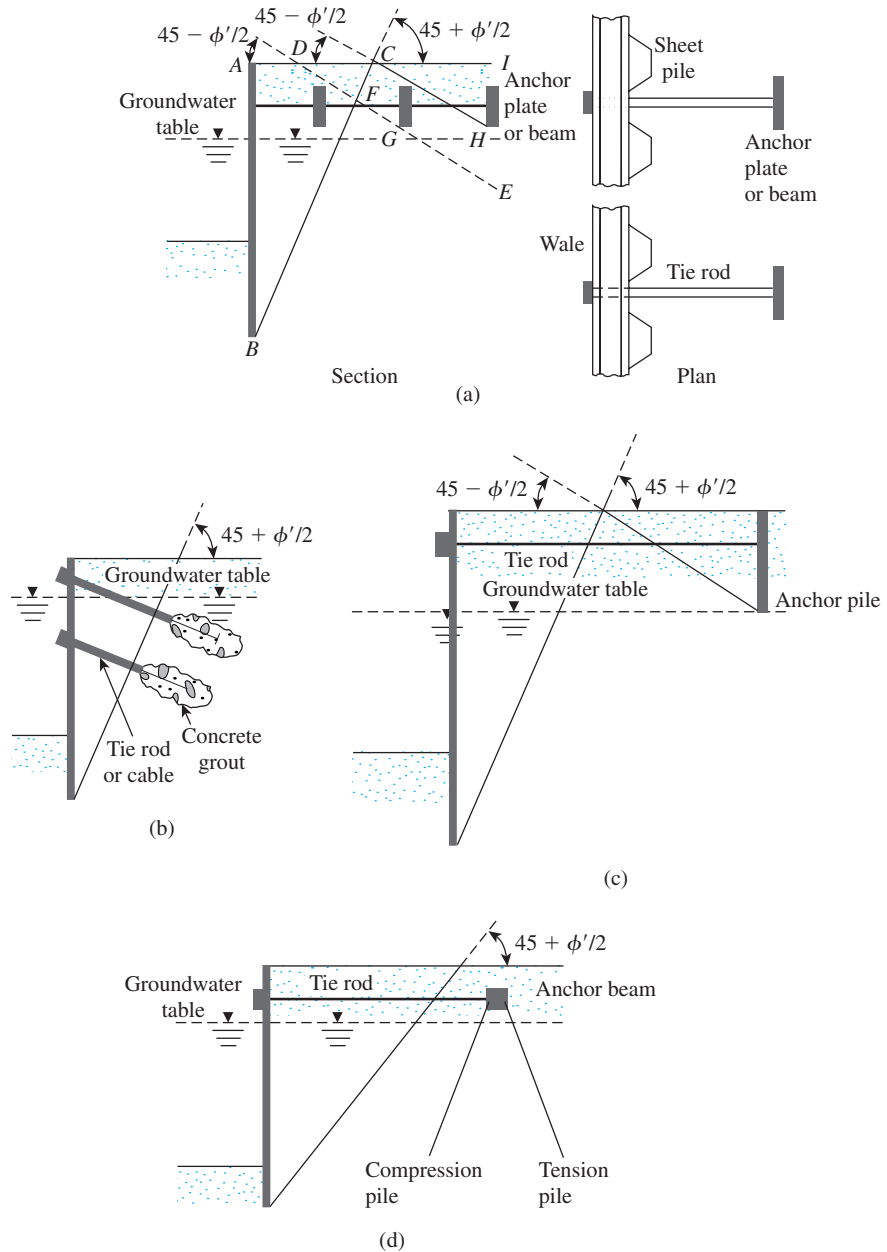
Various types of anchoring for sheet-pile walls: (a) anchor plate or beam; (b) tieback; (c) vertical anchor pile; (d) anchor beam with batter piles
